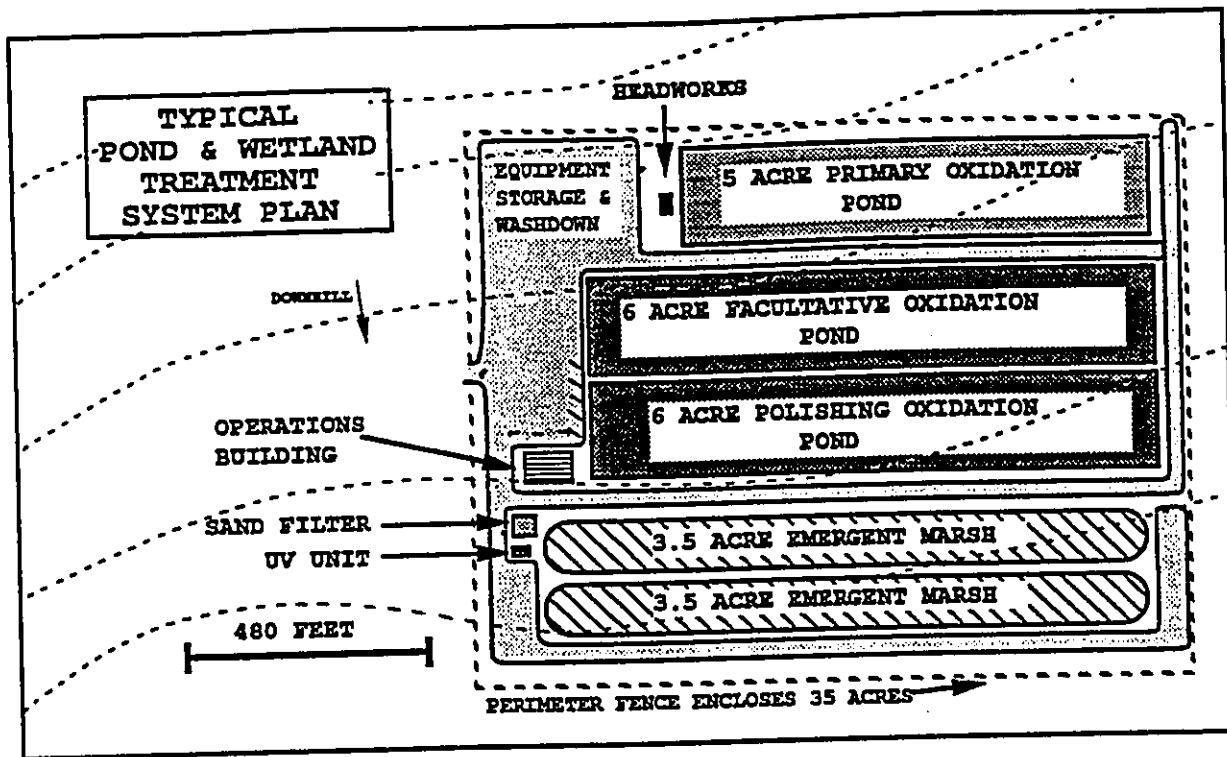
Proposed Site Plan for Each Waialua-Hale'iwa WWTP Facility
